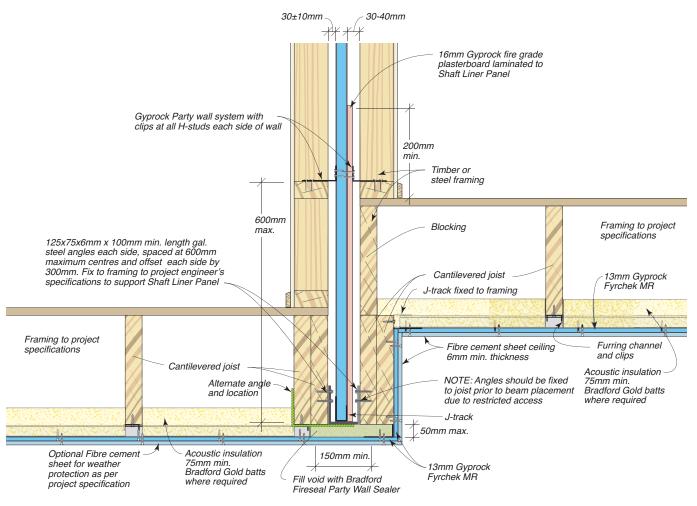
Cantilevered Stepped Soffit - With Cantilevered Timber Or Steel Joists - End Elevation View
